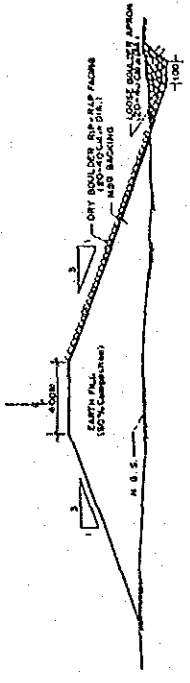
TYPICAL CROSS SECTIONS OF EXISTING DIKE (2/4)
